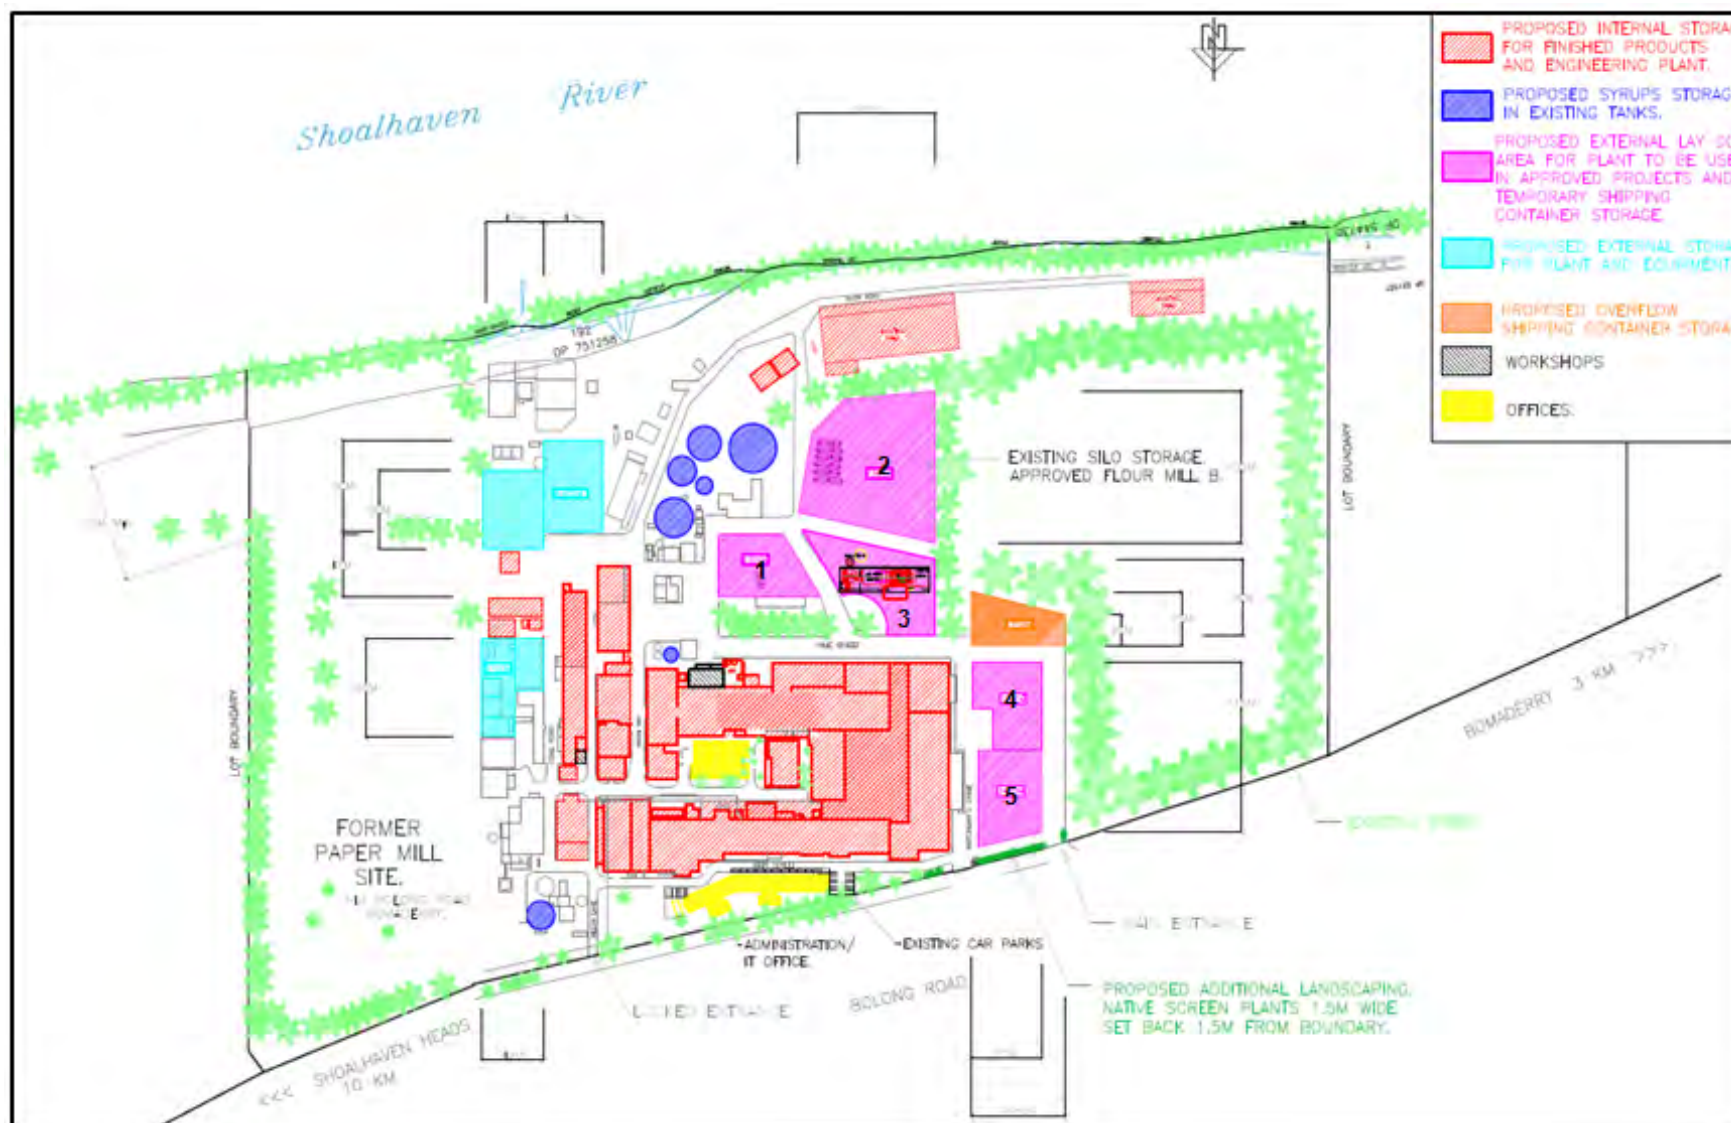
Site plan of Paper Mill Site under proposed Modification.
